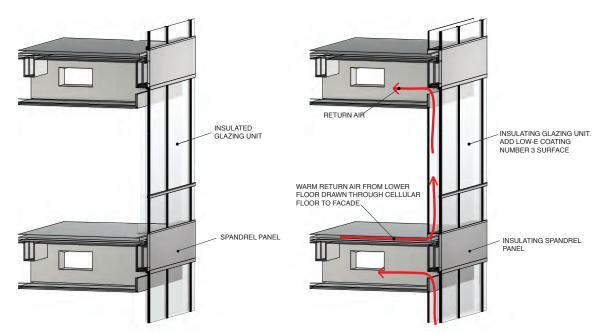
Existing and Proposed Curtain Wall Designs Showing Difference in Appearance. Source: SOM Archives, 2008.
